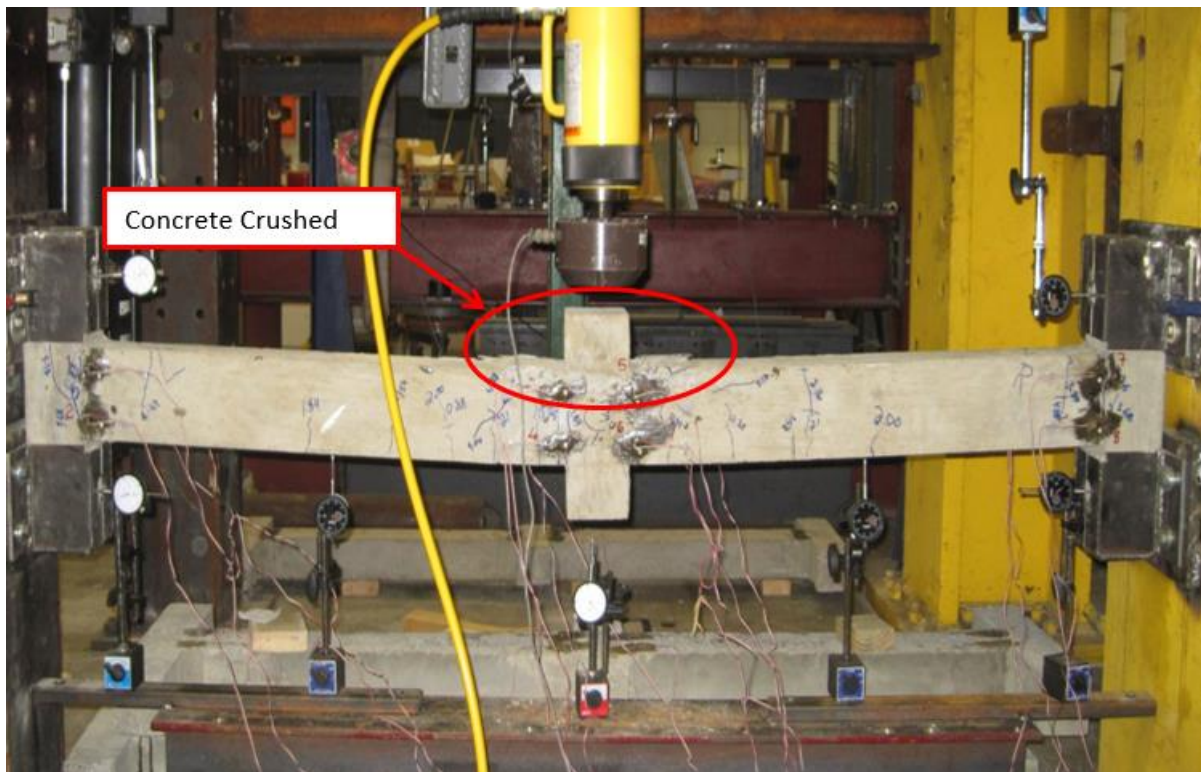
Crack Pattern at the Collapsed Load for Specimen B2-2
